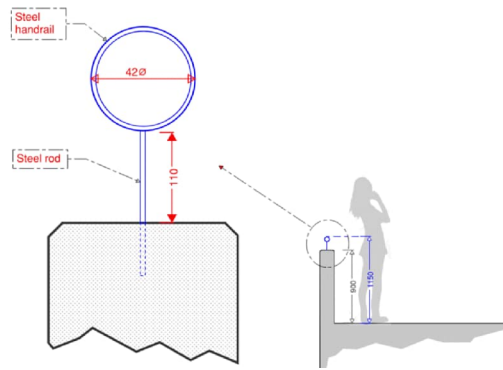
Section detail of the proposed steel handrail affixed to the top of the existing concrete balustrade. Source: Lendlease, 2024.
